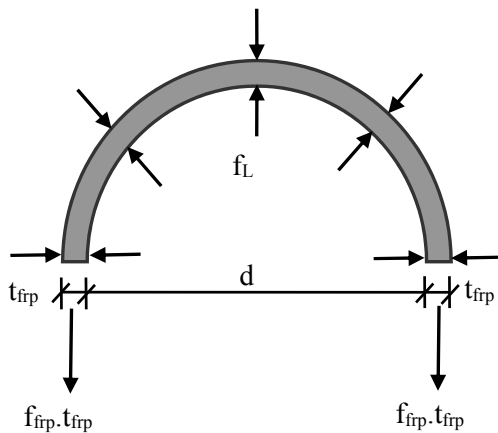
Confinement action of FRP Jacket in circular sections [6].
